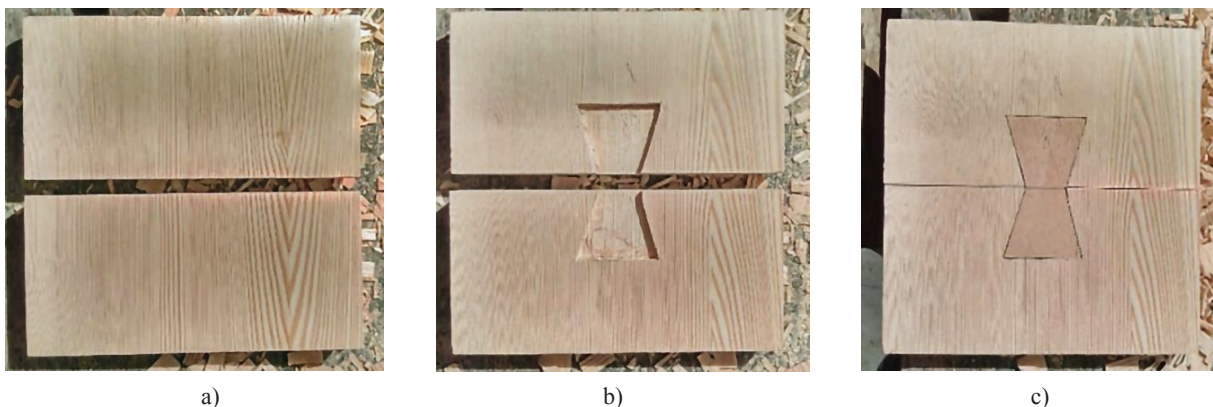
Crafting of a dovetail joint: a) elements, b) making a groove, c) final joint
